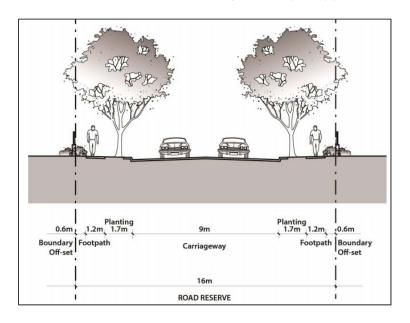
| Typical road section as shown in the DCP (Source: DPIE 2015)
